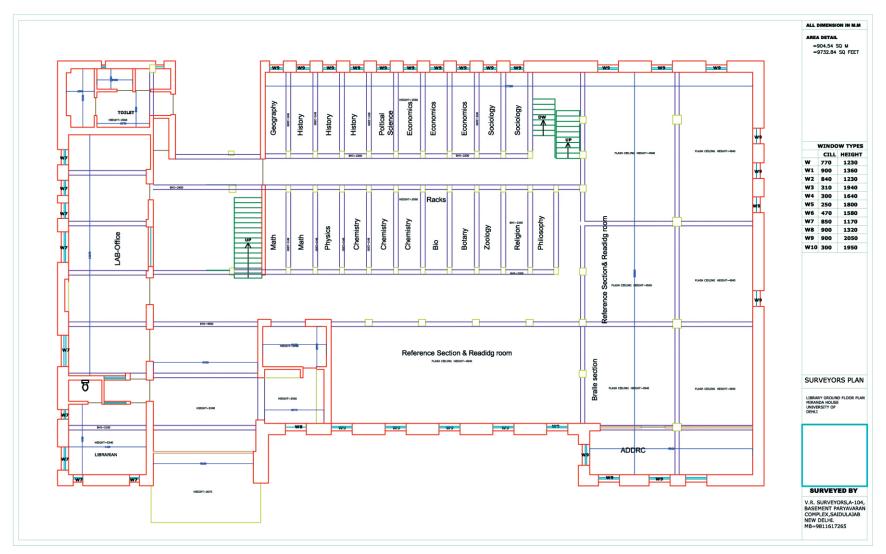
(d): Layout plan of MH Library: Ground Floor
